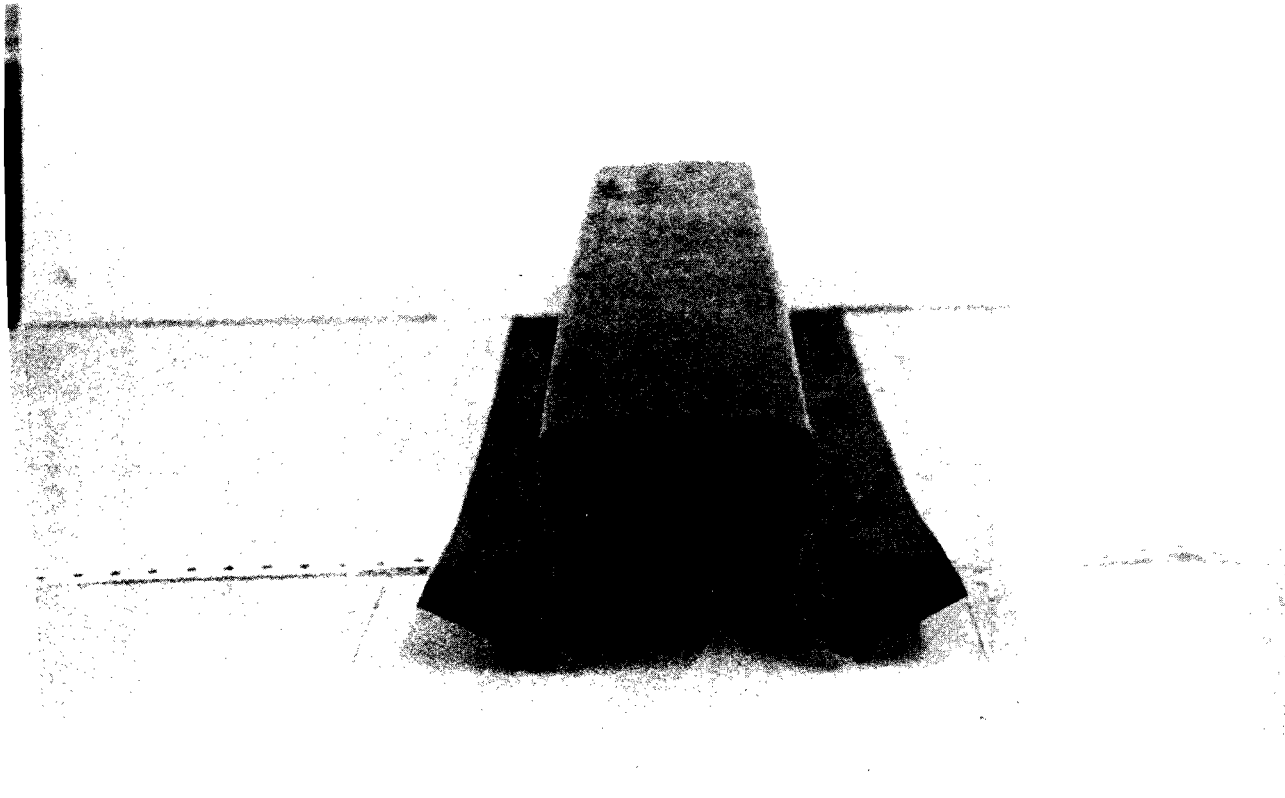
Photograph Showing Typical Failure of Hat Section
